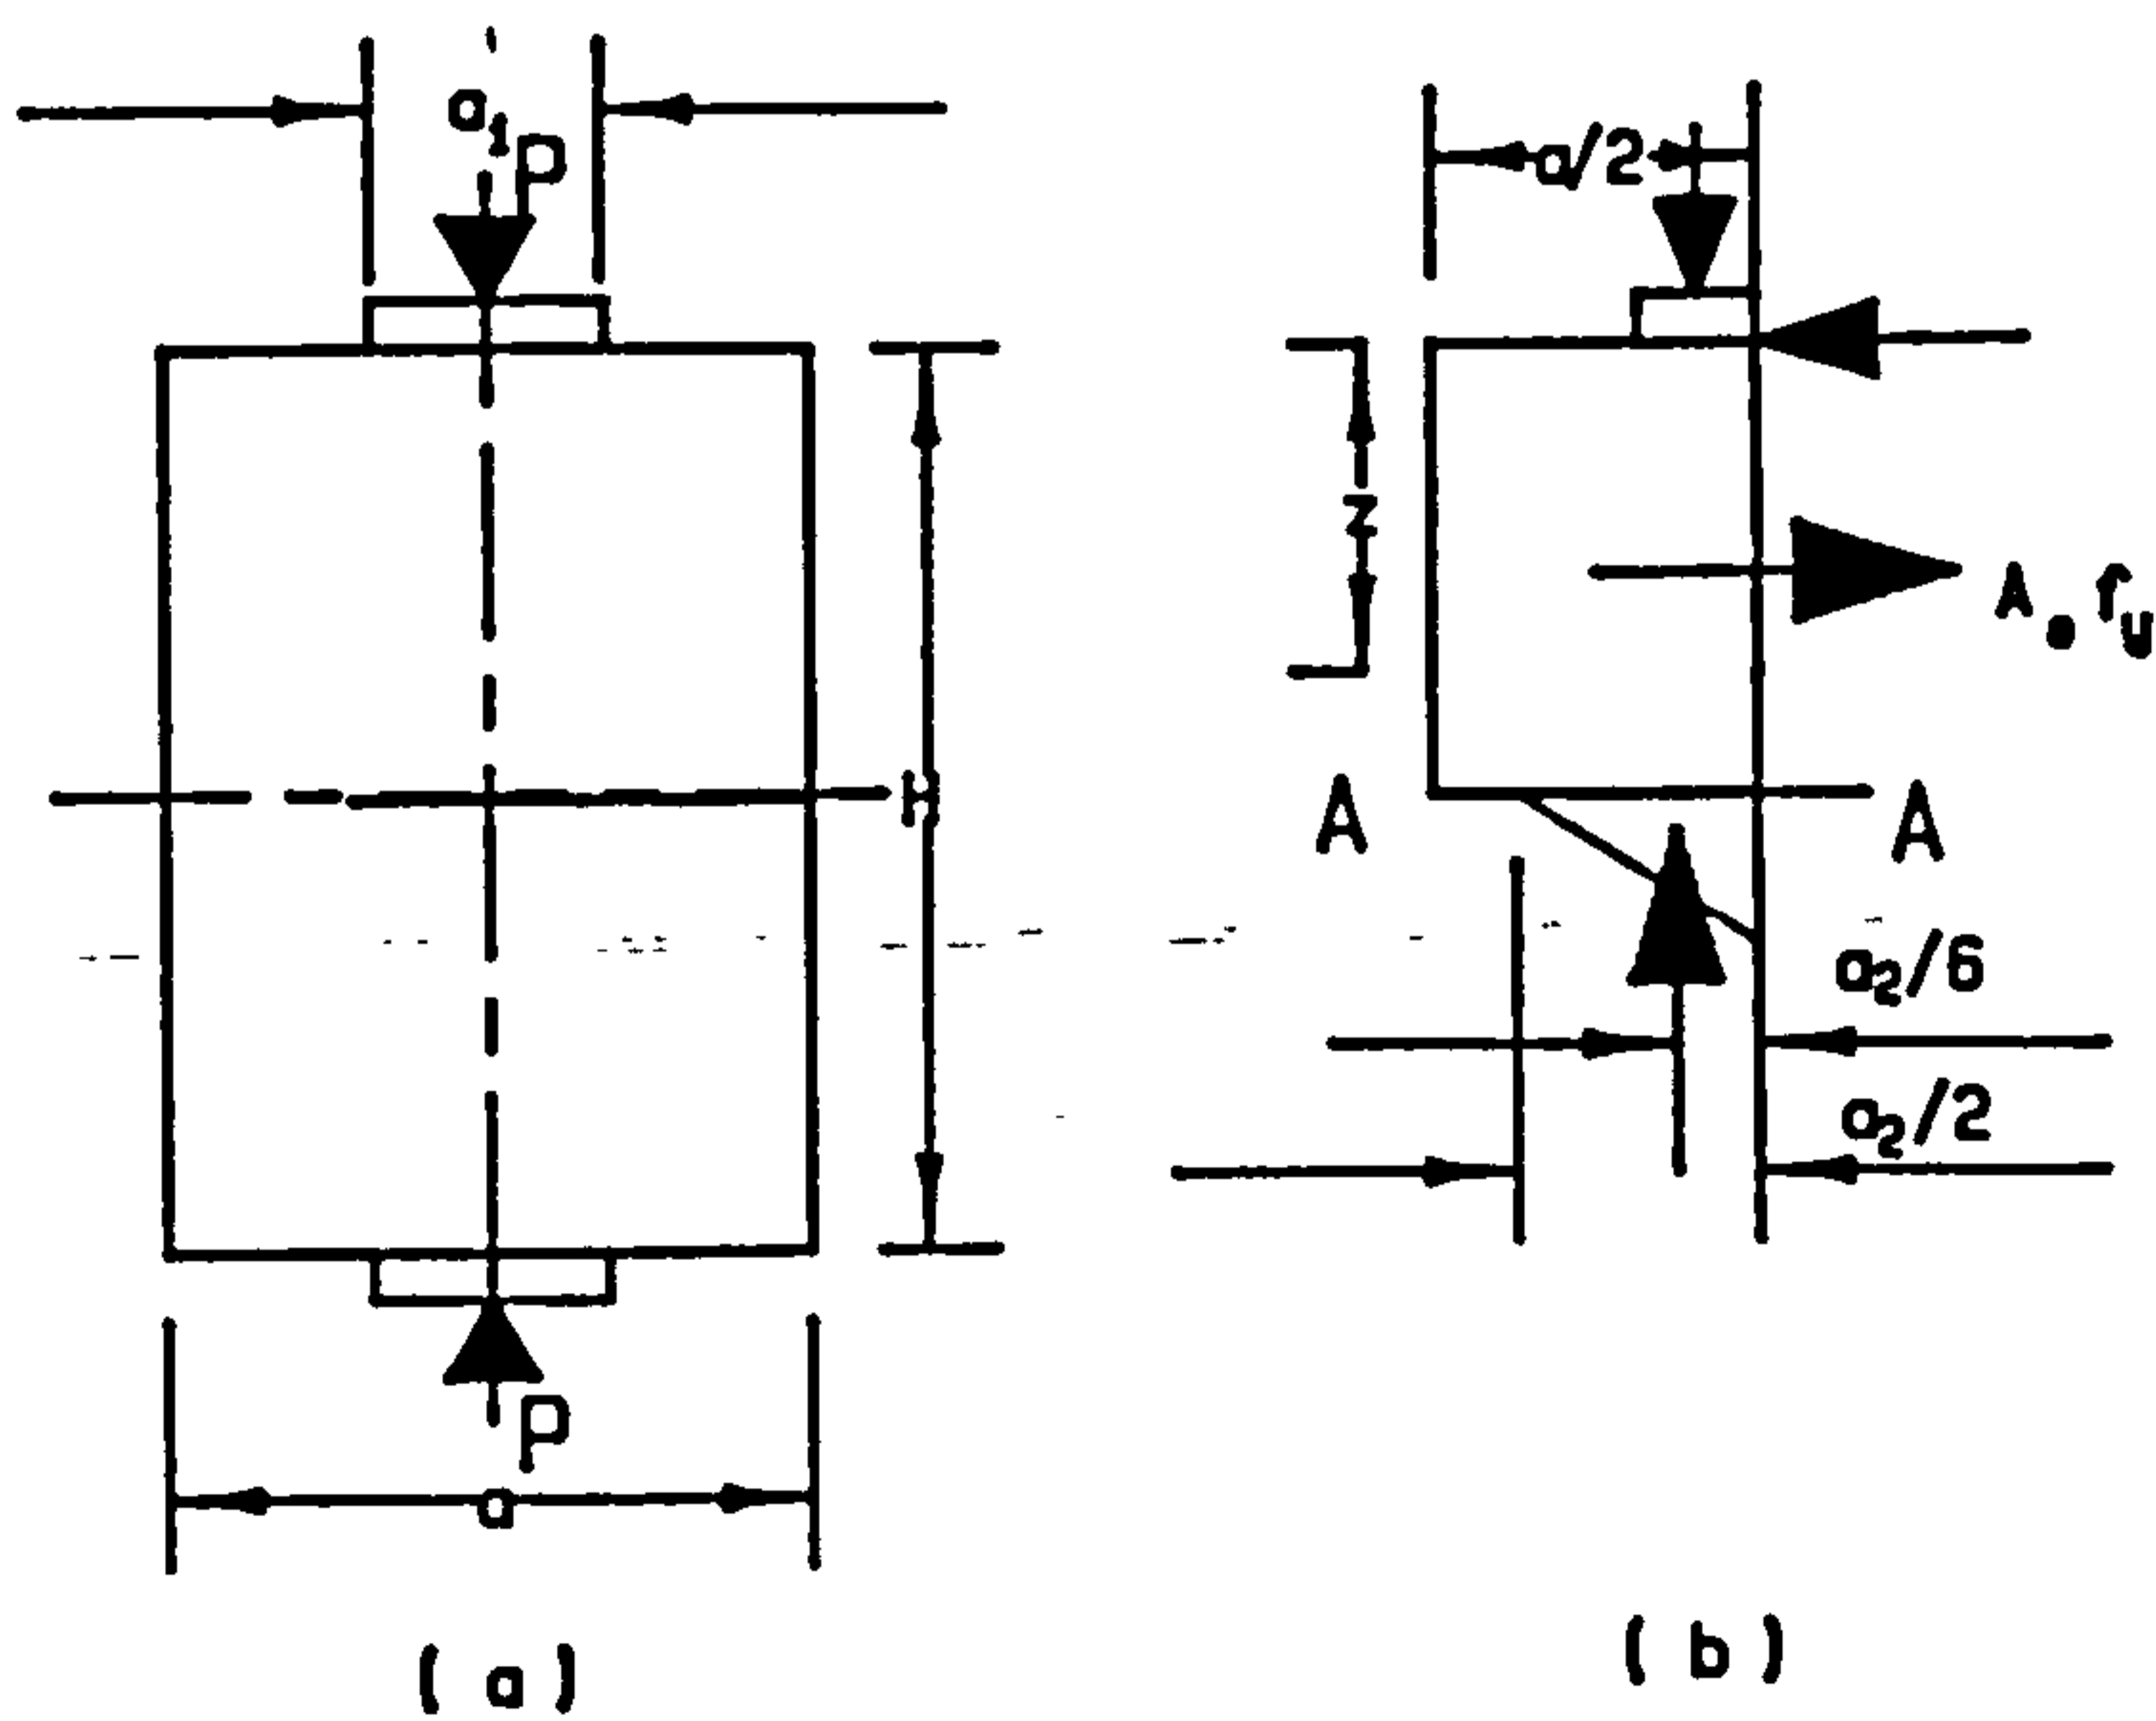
Al-Najjim's failure mechanism for reinforced concrete blocks.
